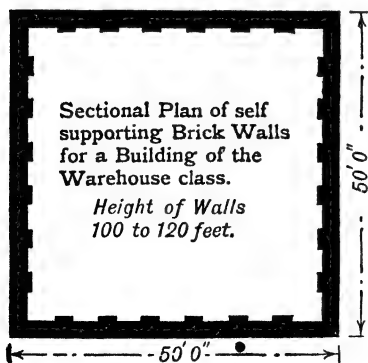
Ratio of Plan Area of Walls to Area of Building.
